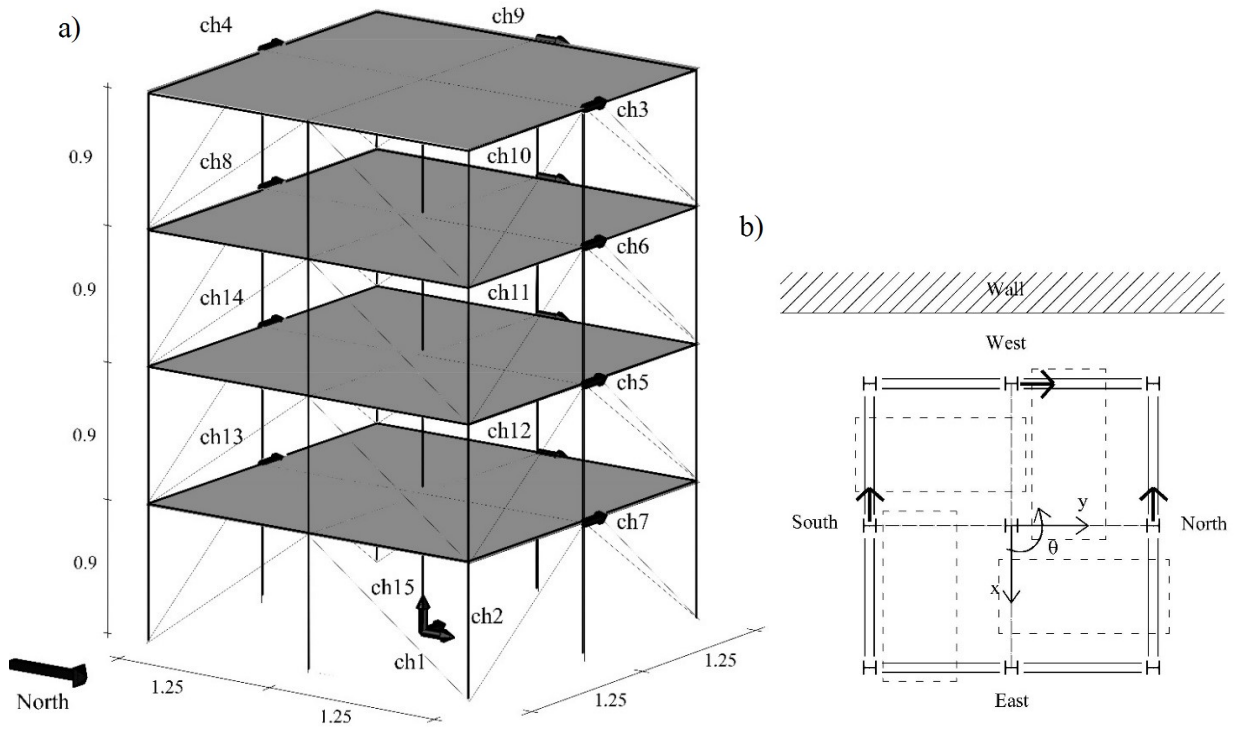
Layout of the sensors used in the ambient vibration tests (dimensions in m): a) 3D view; b) plan view.
